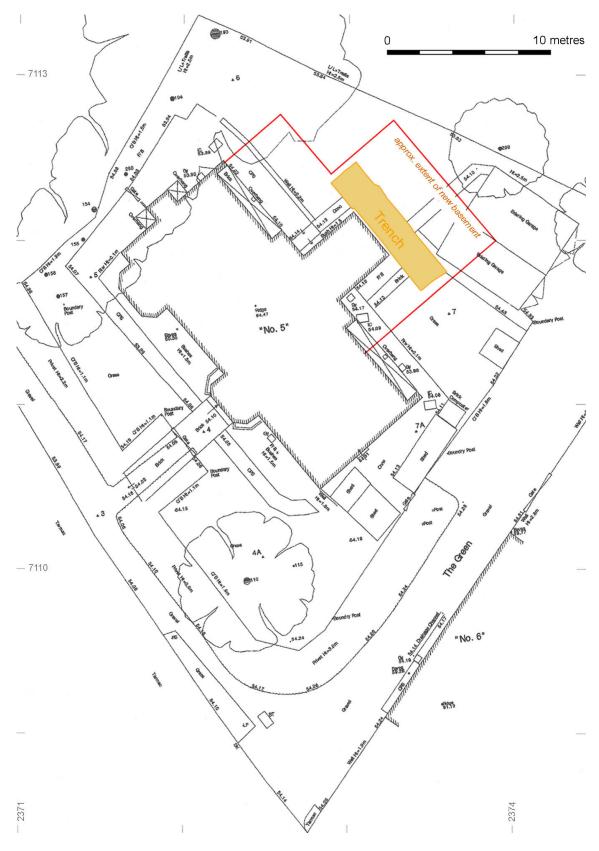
Plan of the existing site and building of No. 5 The Green, with the extent of the new basement marked and the location of the evaluation trench
